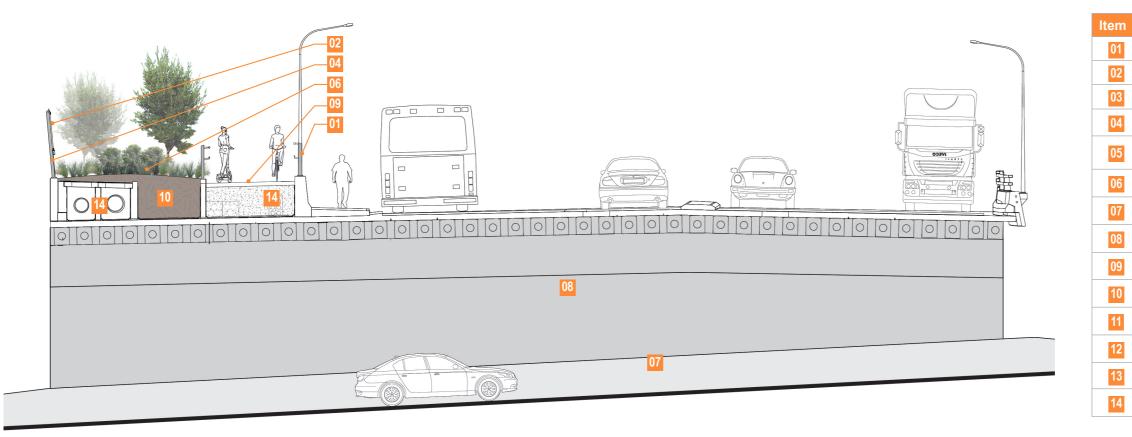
Ernest Street Active Transport Bridge - Future state - Section CC 1:100
